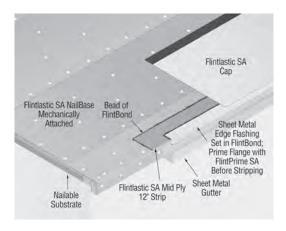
Rain Gutter Edge Detail 2 Ply
